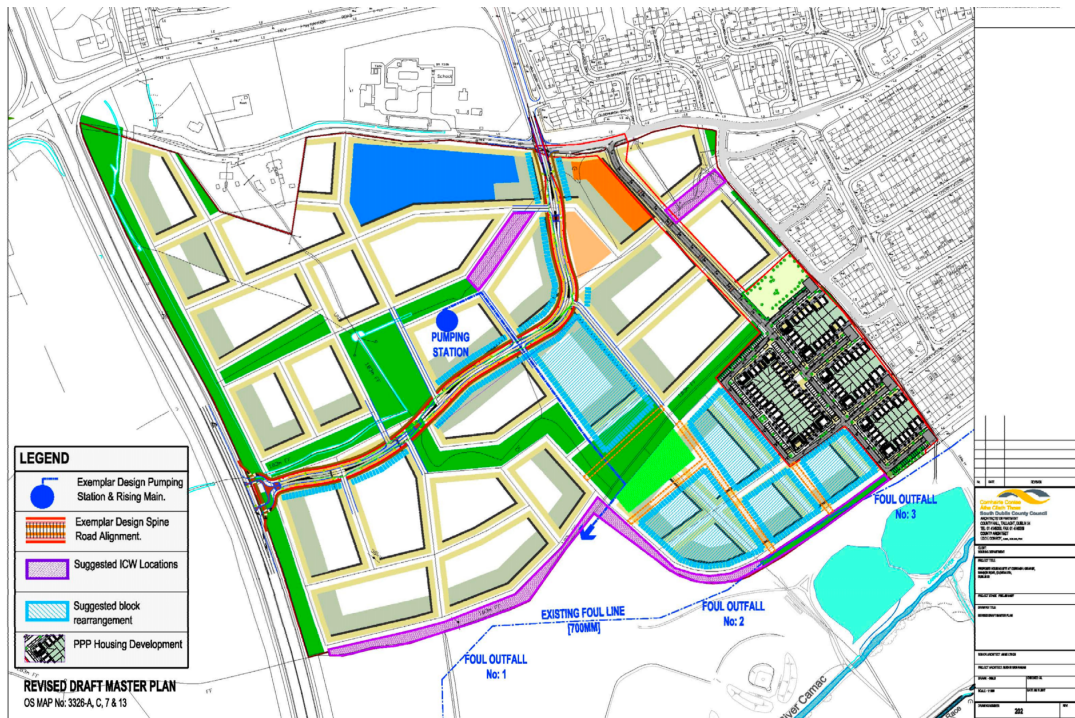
Extract from the Kilcaberry – Grange Masterplan (2017) showing the indicative layout.
